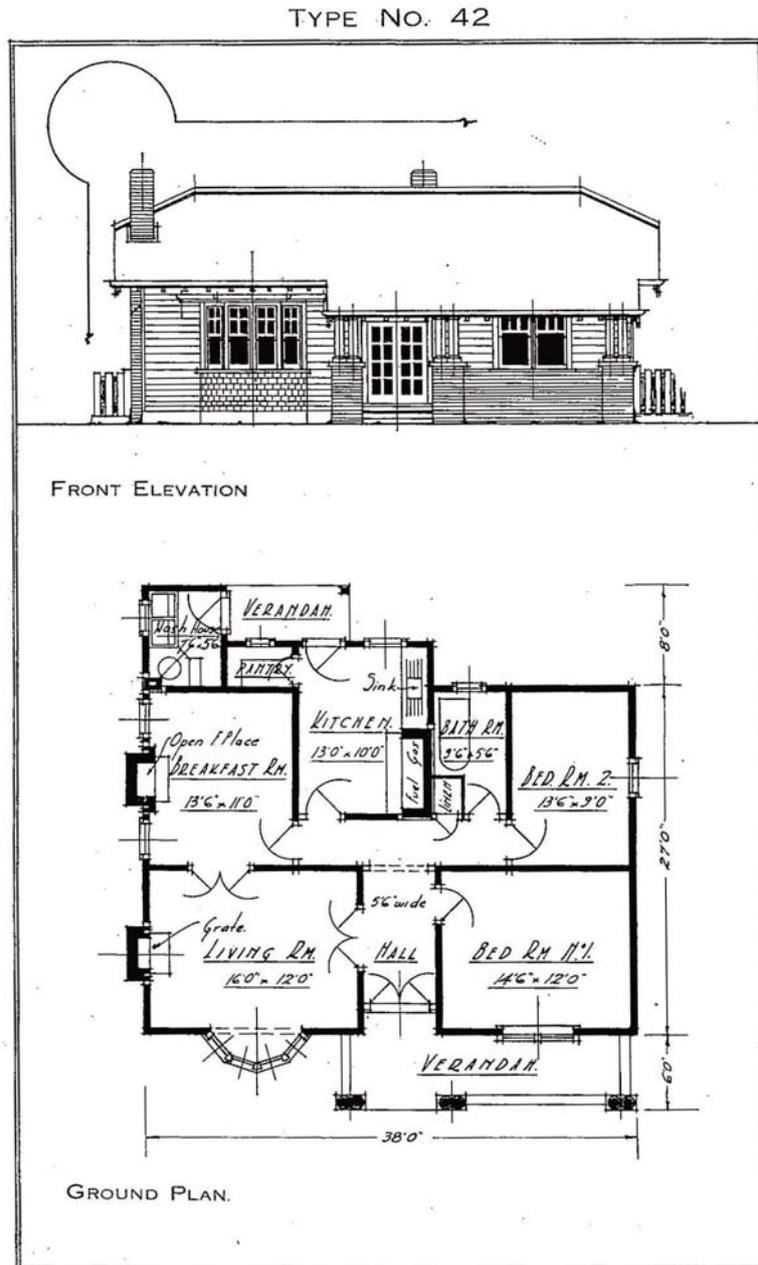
G. Burrige Leith, 'Type T42' Cottage Design. Source: *The State Savings Bank of Victoria Design Book: Timber-Framed Dwellings Containing 56 Standard Types*, March 1929, VPRS8933/P0437, Units 2 and 3, PROV.
